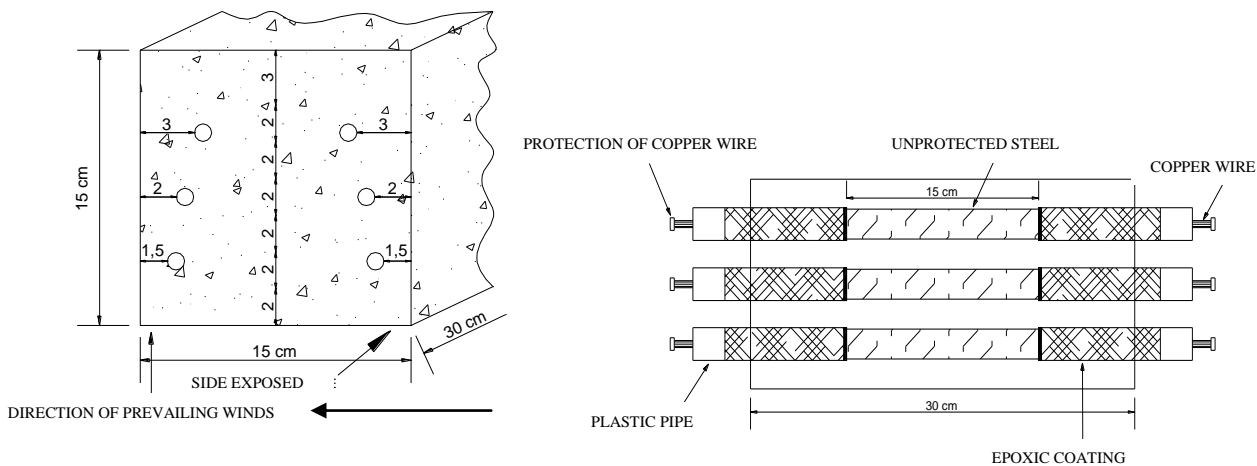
Sketch of the transverse and longitudinal section of the reinforced concrete beams of the DURACON project
